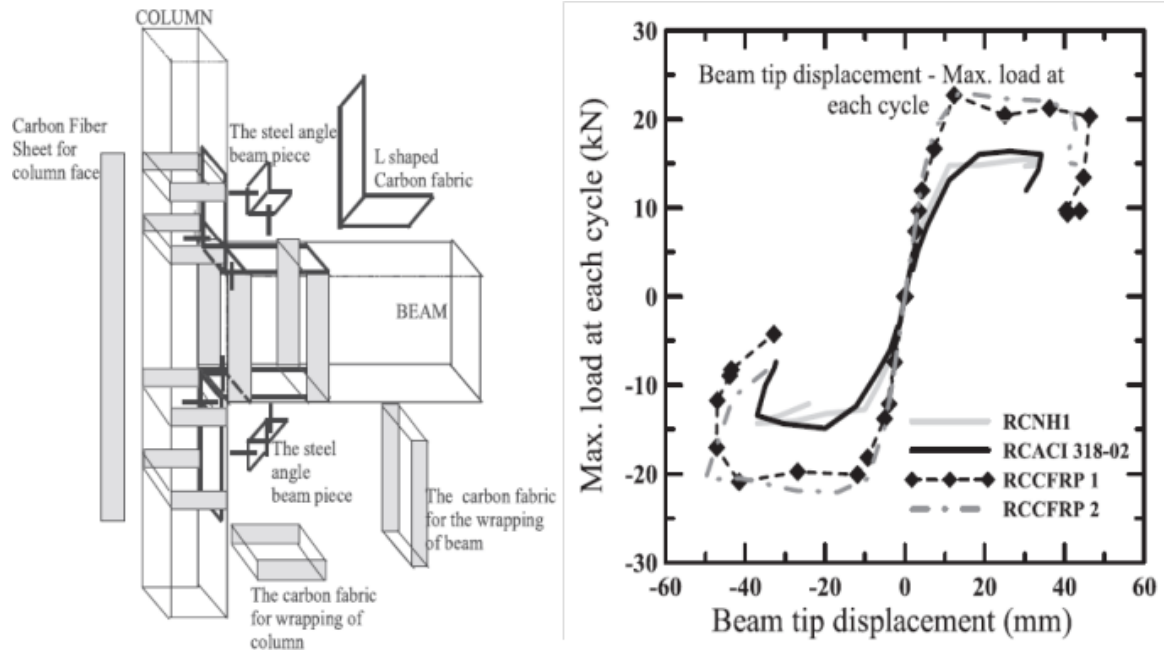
Reinforcement Details of Exterior Beam-Column Joint Specimens [3]
